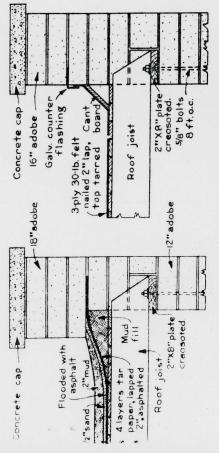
Two methods of building flat roofs on earth-block buildings.
